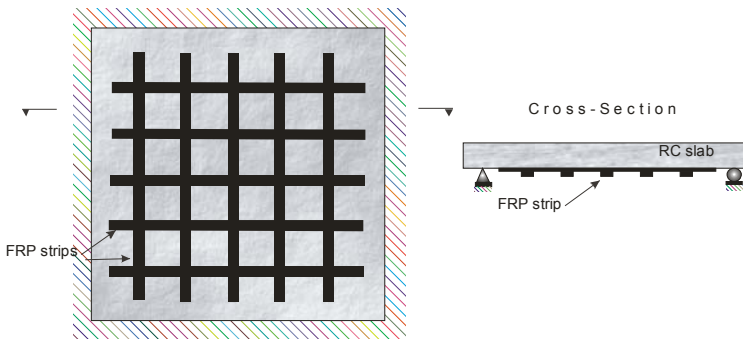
FRP strengthening of a two-way slab: a-slab soffit; b- cross section
